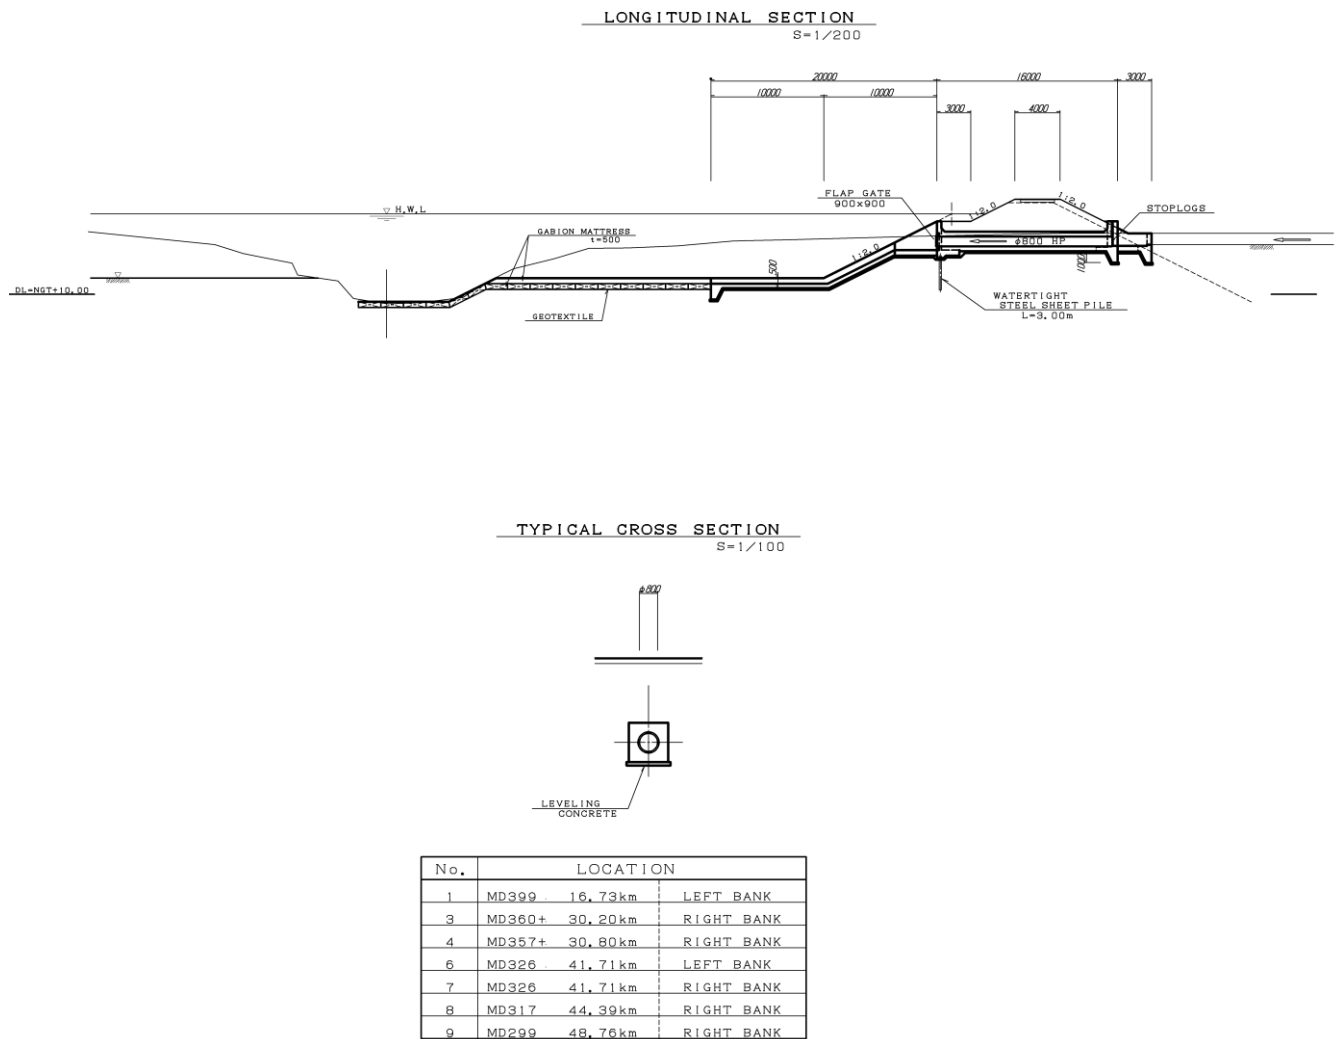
Typical Structure of Rebuilt Sluiceway (φ 800 Cross Section)
